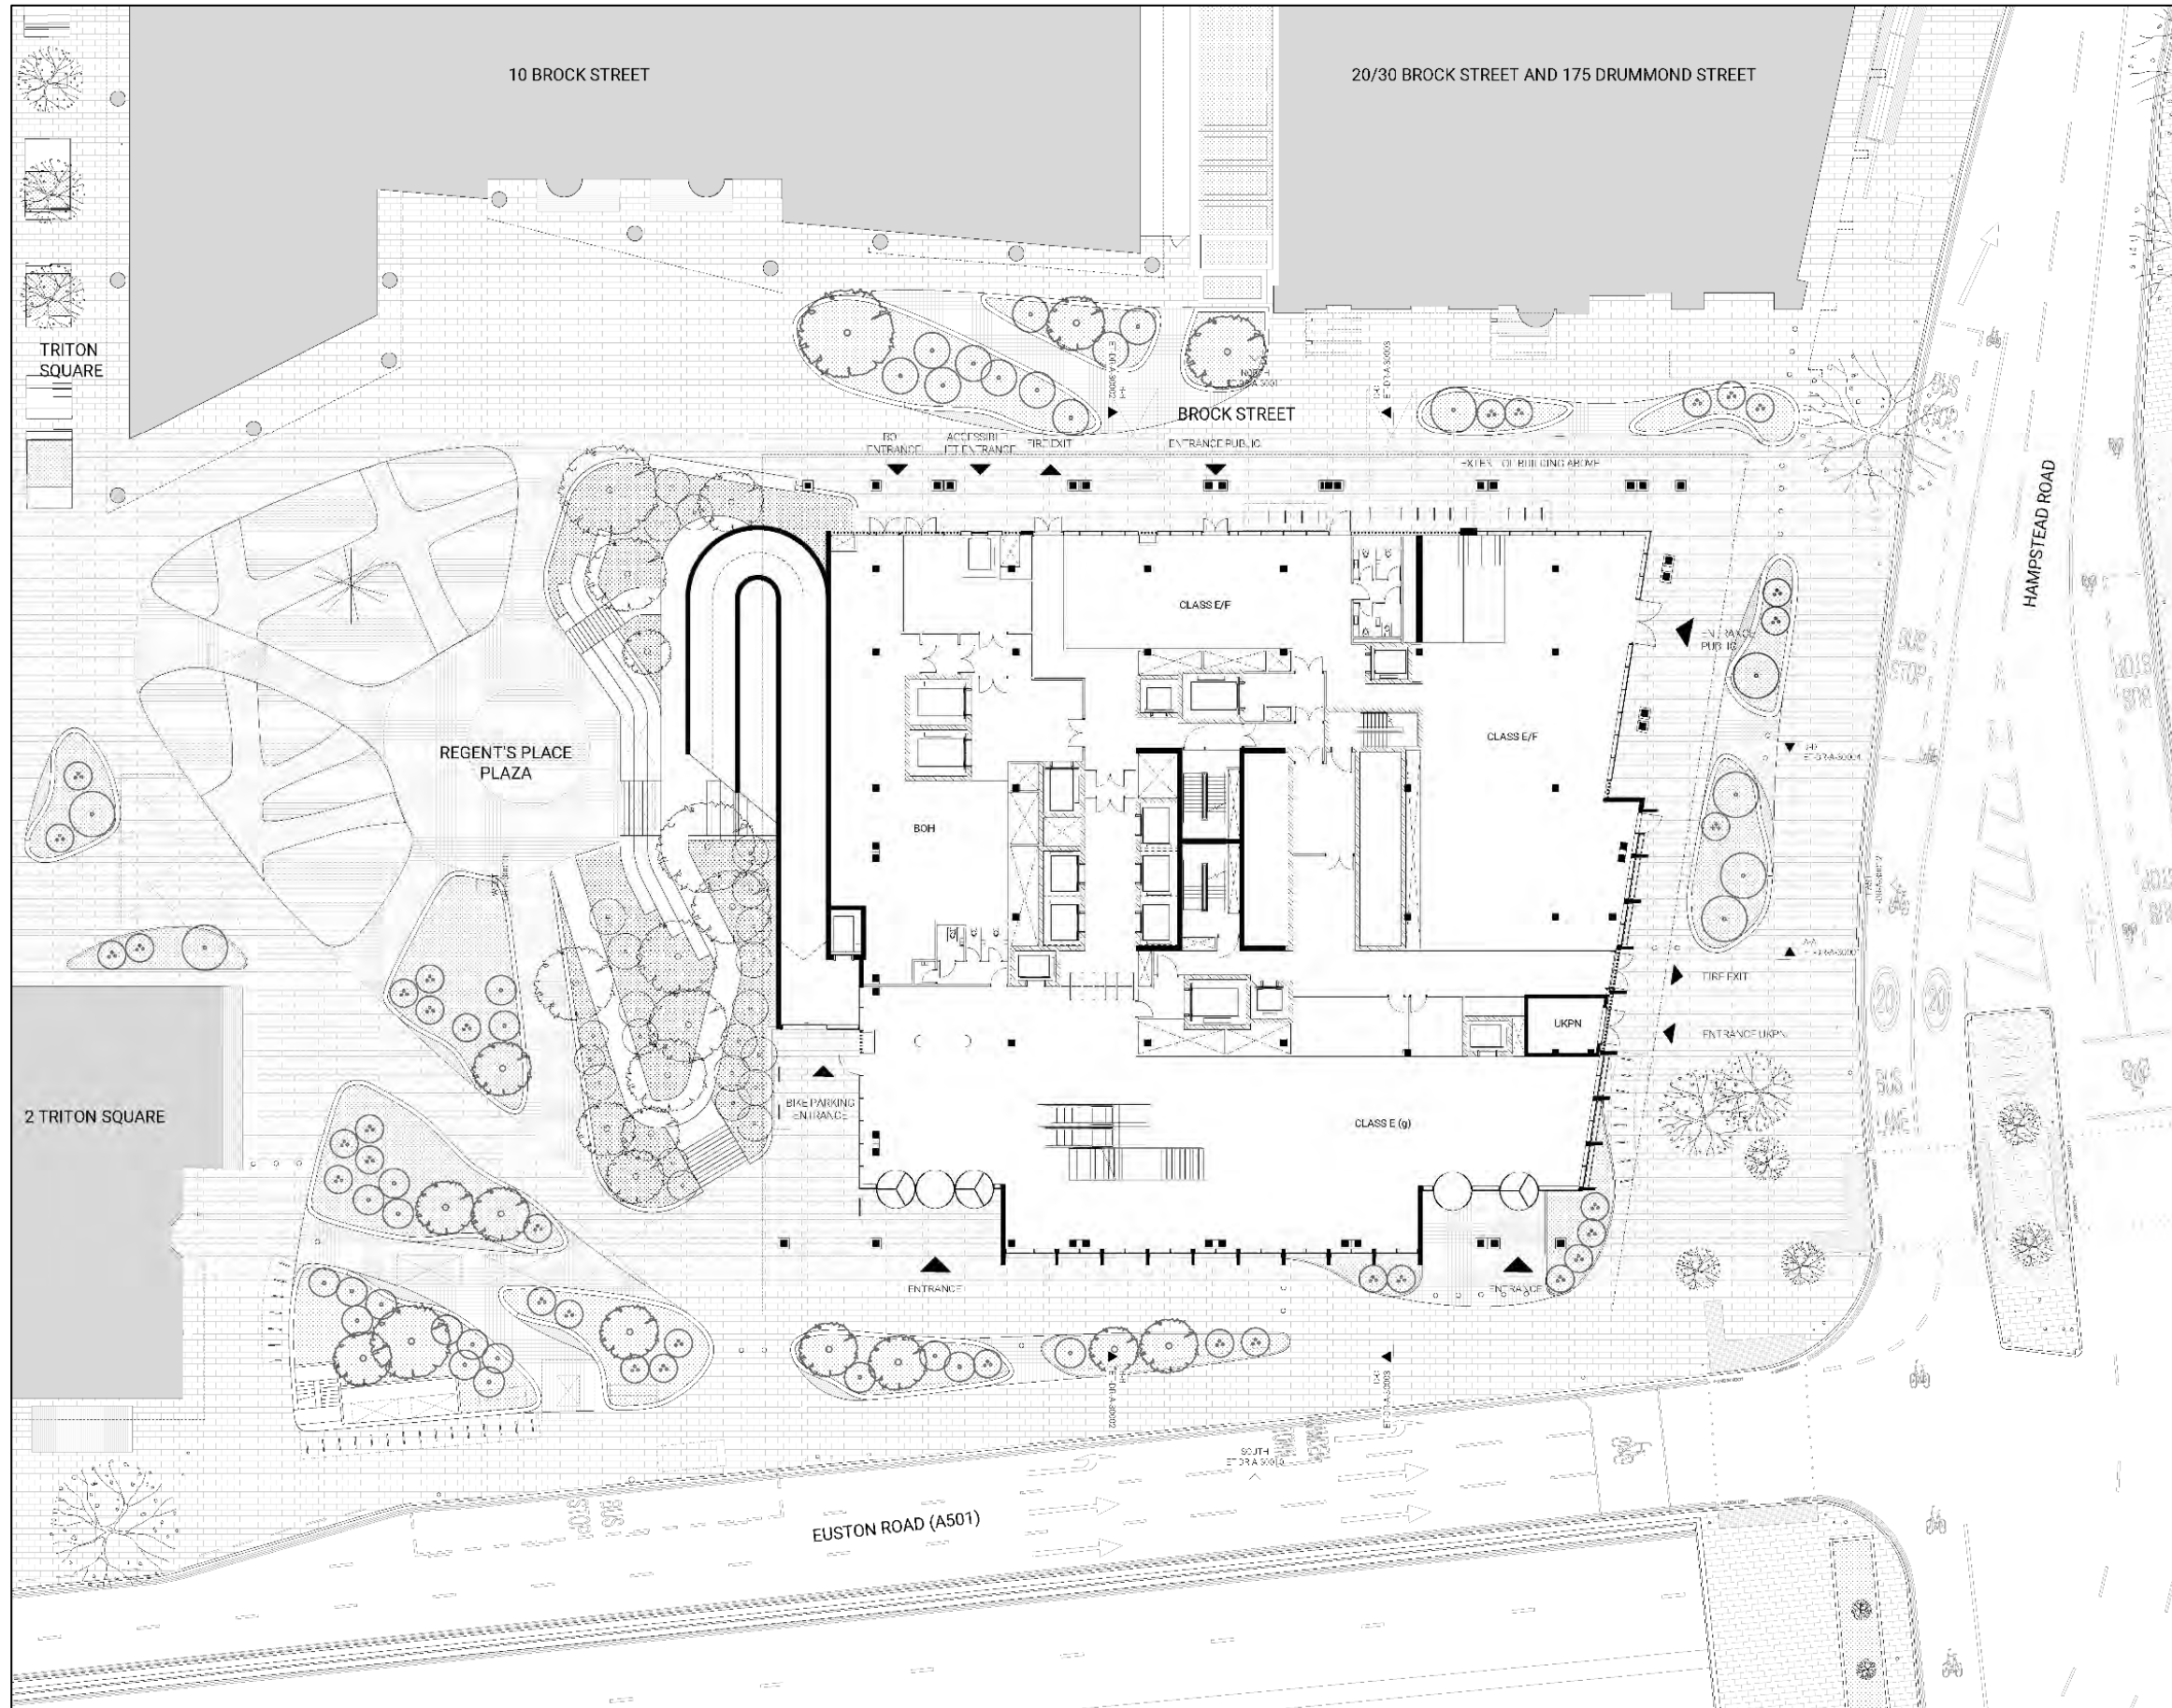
Indicative Layout – Lab-Enabled Floorspace
